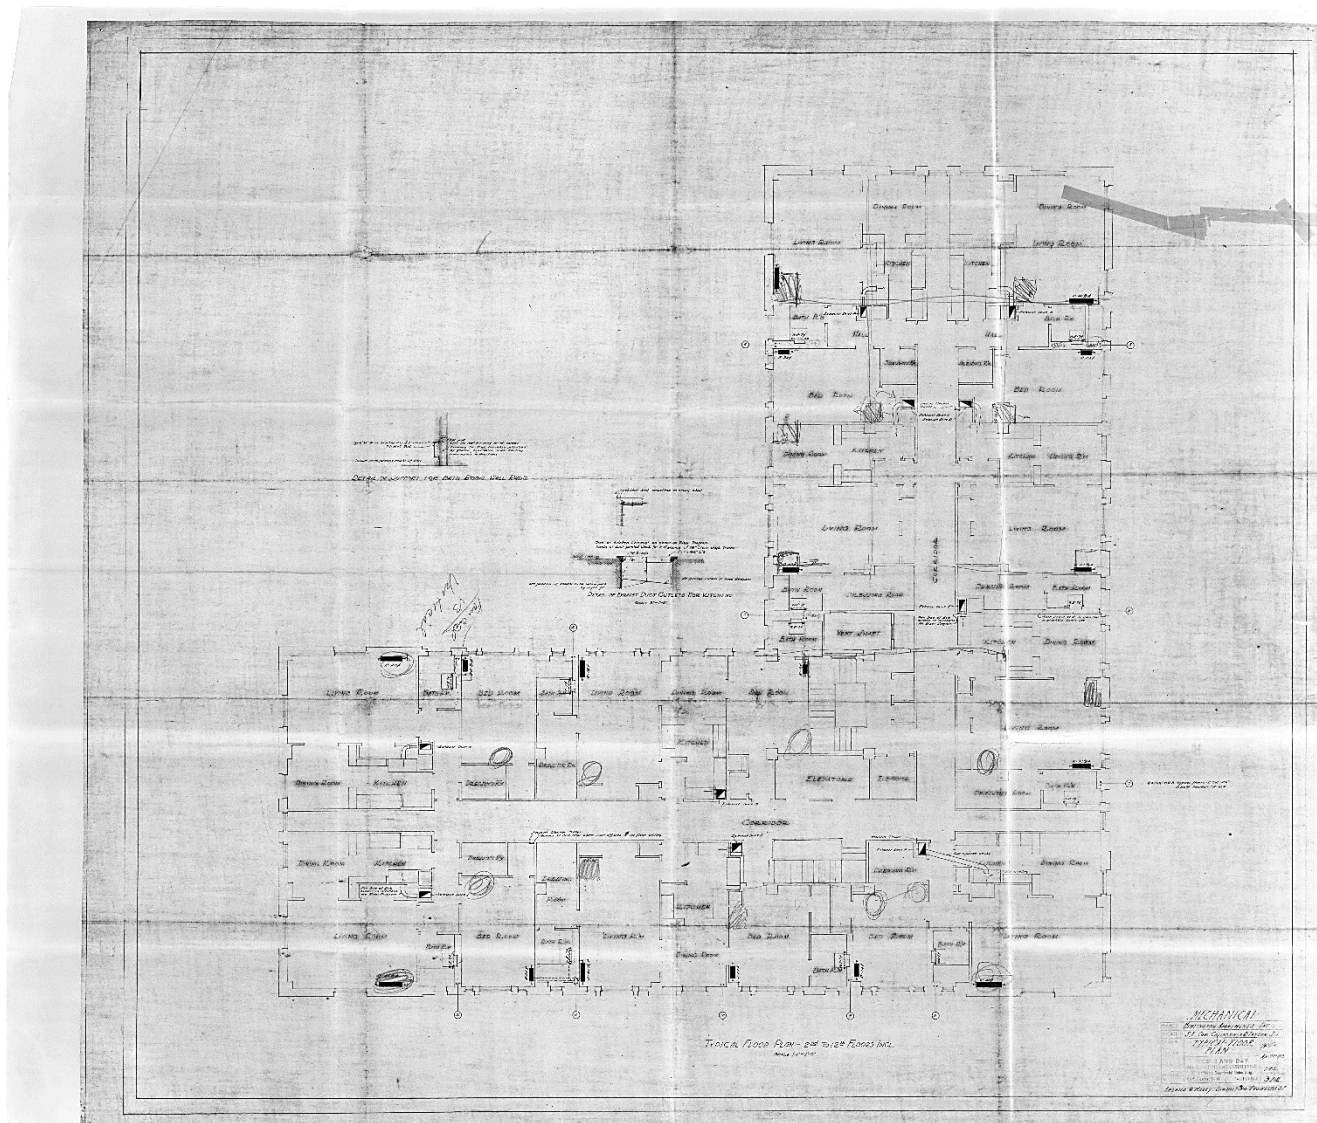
Typical upper floor, original plan, showing elevators, open stair, and double-loaded L-shaped corridors. Source: Weeks & Day, Huntington Apts Inc., Typical Floor Plan (Mechanical), dated 21 April 1923.
